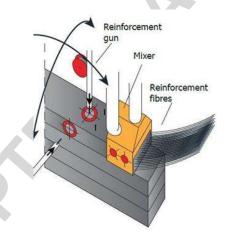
Reinforcement for concrete printing (de Witte 2015)
